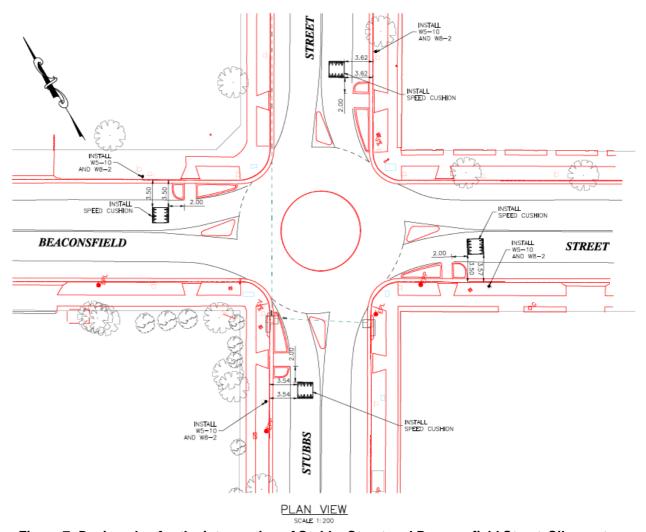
Design plan for the intersection of Stubbs Street and Beaconsfield Street, Silverwater
